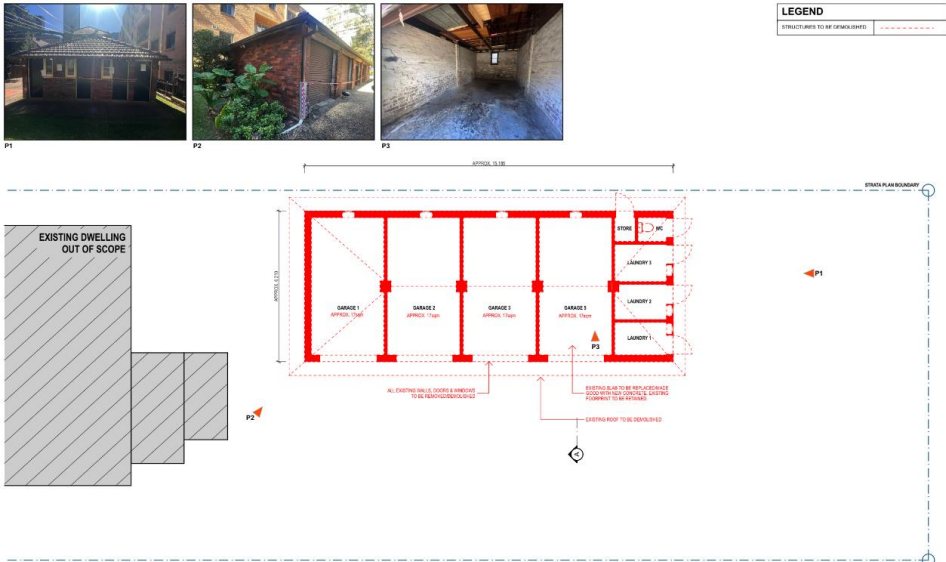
Demolition plan for the existing garage within the subject site (Source: The Plan Show, Drawing No. DR-4395, Sheet 03, 02.08.23)
